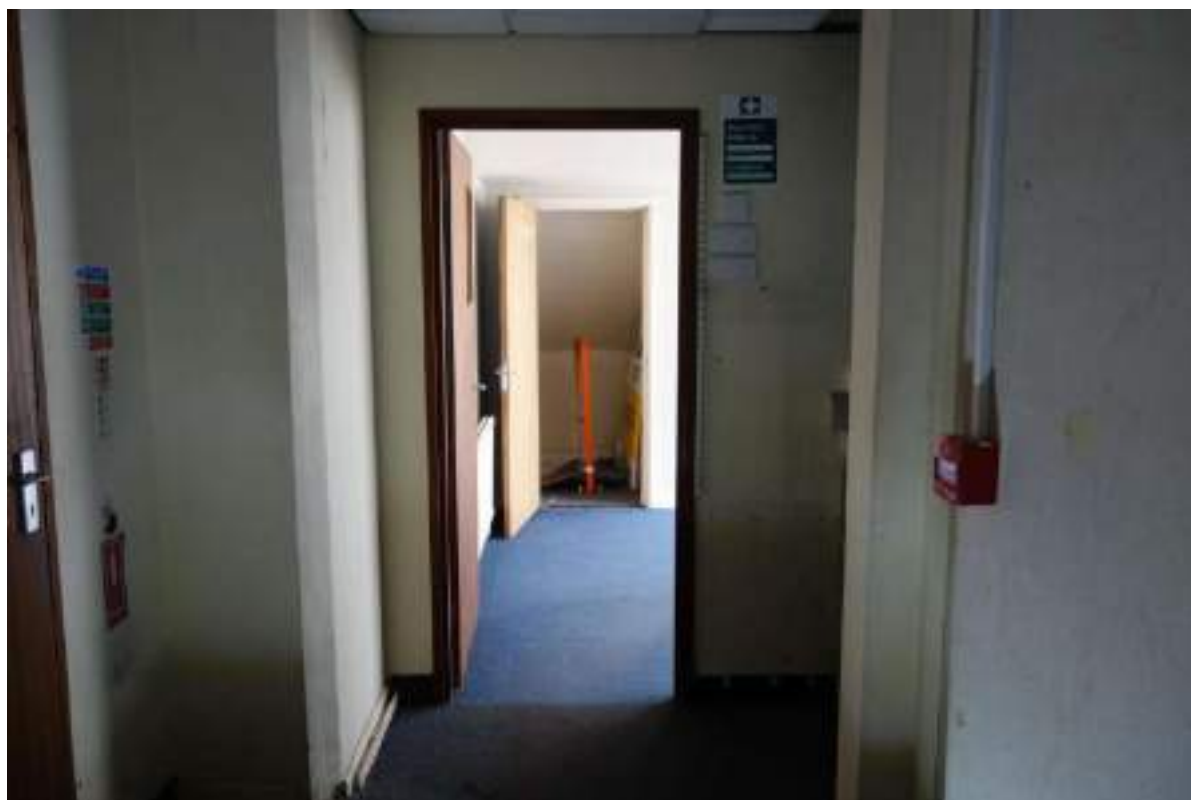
View looking N in GF Room 2, towards GF Room 4.
